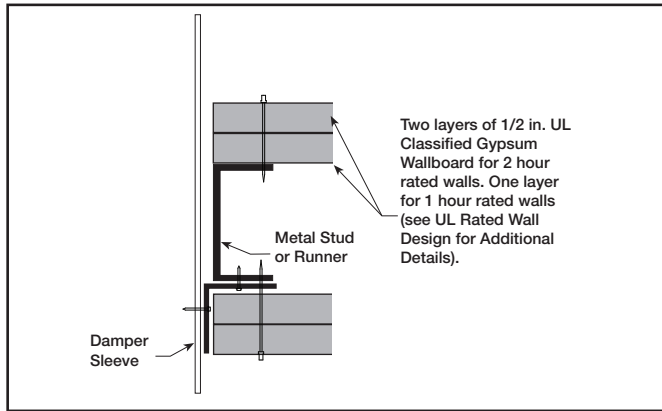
Single Side Angle With Steel Stud Wall - Angle Under Wallboard
